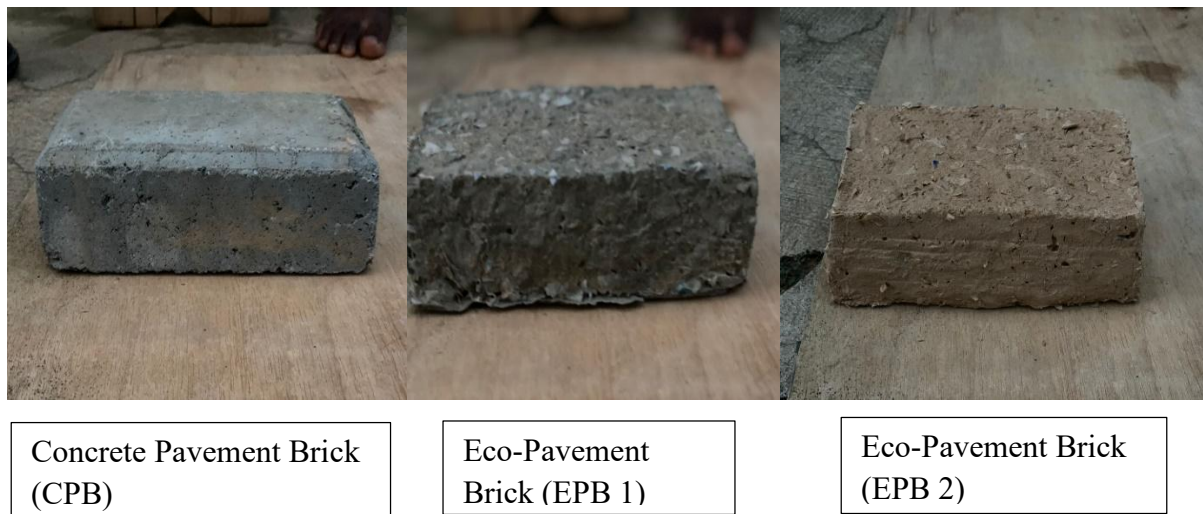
Constructed eco-pavement bricks and an acquired concrete brick.
